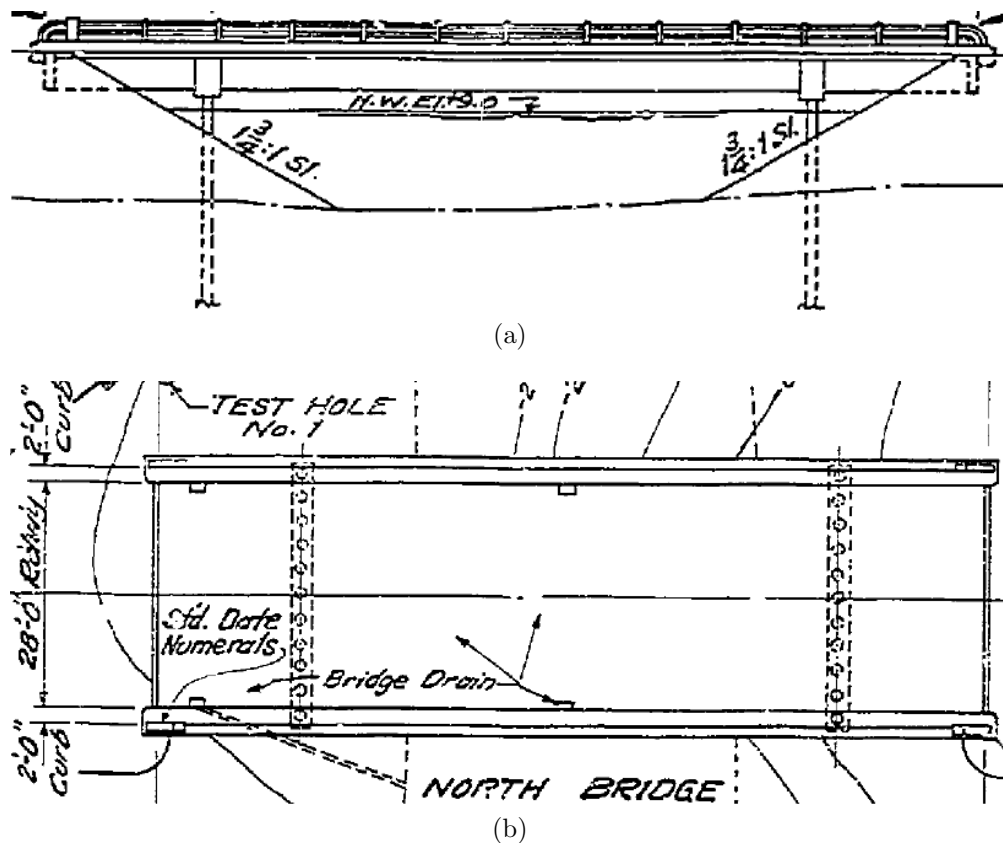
Bridge 7 in (a) elevation and (b) plan view
